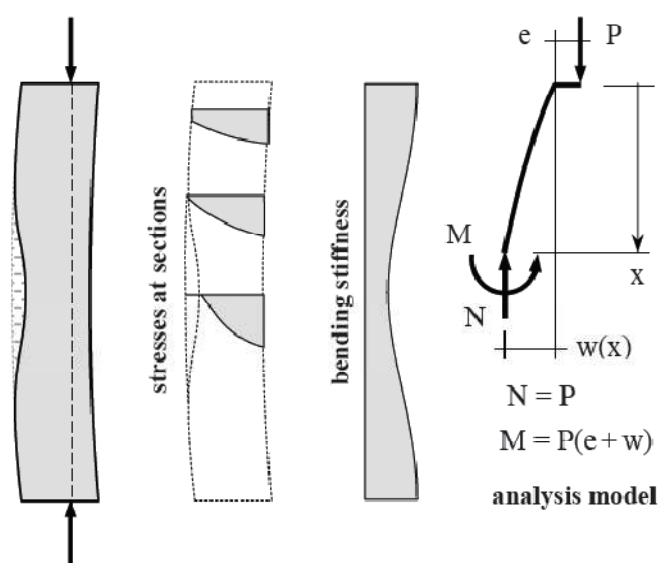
Masonry wall under eccentric compression (Vassilev et al. 2009).
